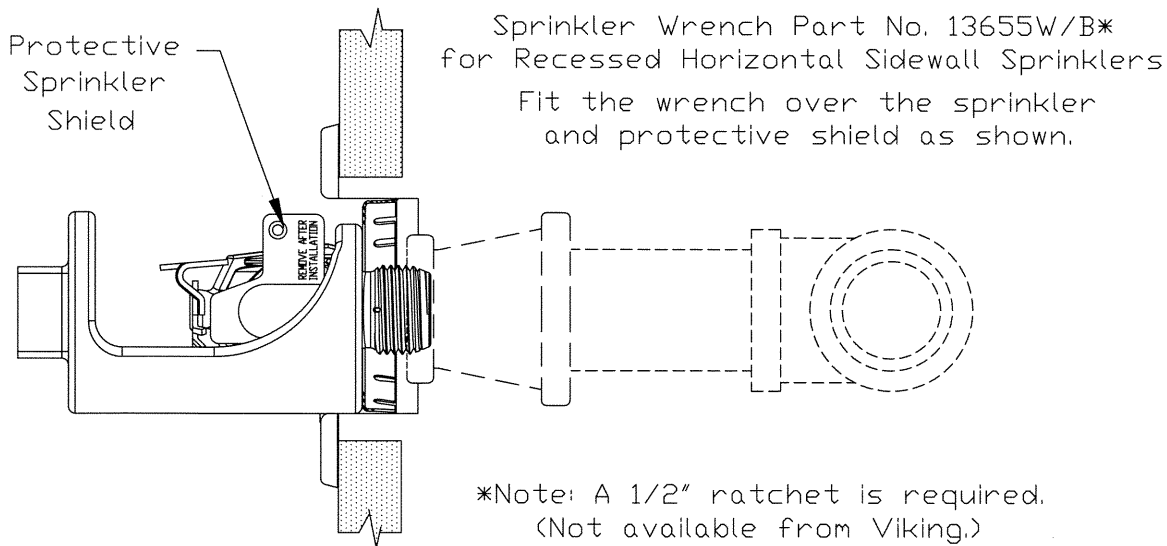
Wrench 13655W/B for Recessed Horizontal Sidewall Sprinklers
